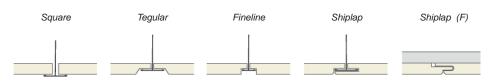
TYPICAL INSTALLATION DETAIL - RONDO DUO EXPOSED GRID SUSPENDED CEILING SYSTEM
